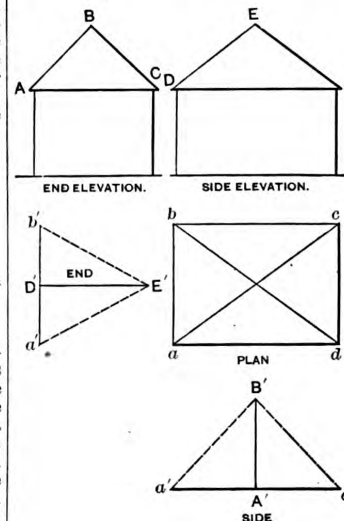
End and Side Elevations of Building with Hipped Roof.
